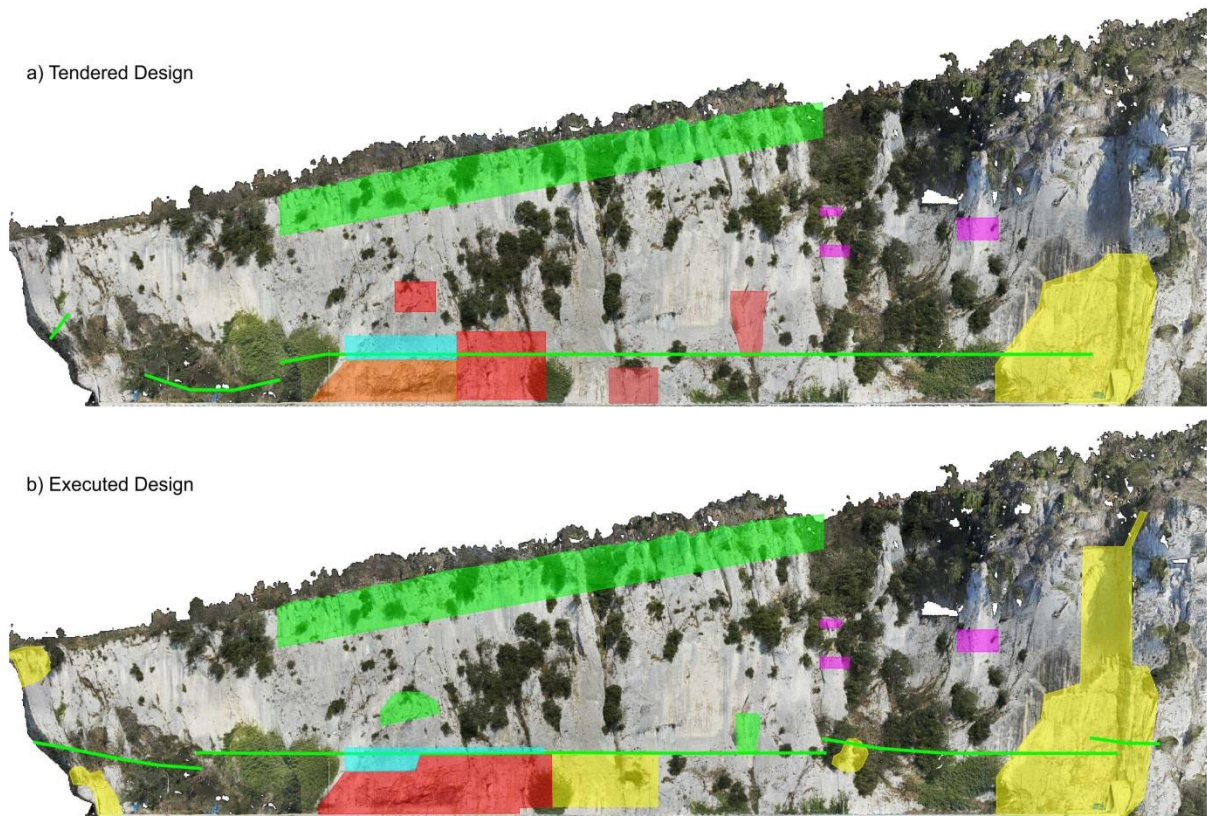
Mitigation layout for the tendered design and the executed design overlaying an orthophoto draped over a 3D model.
